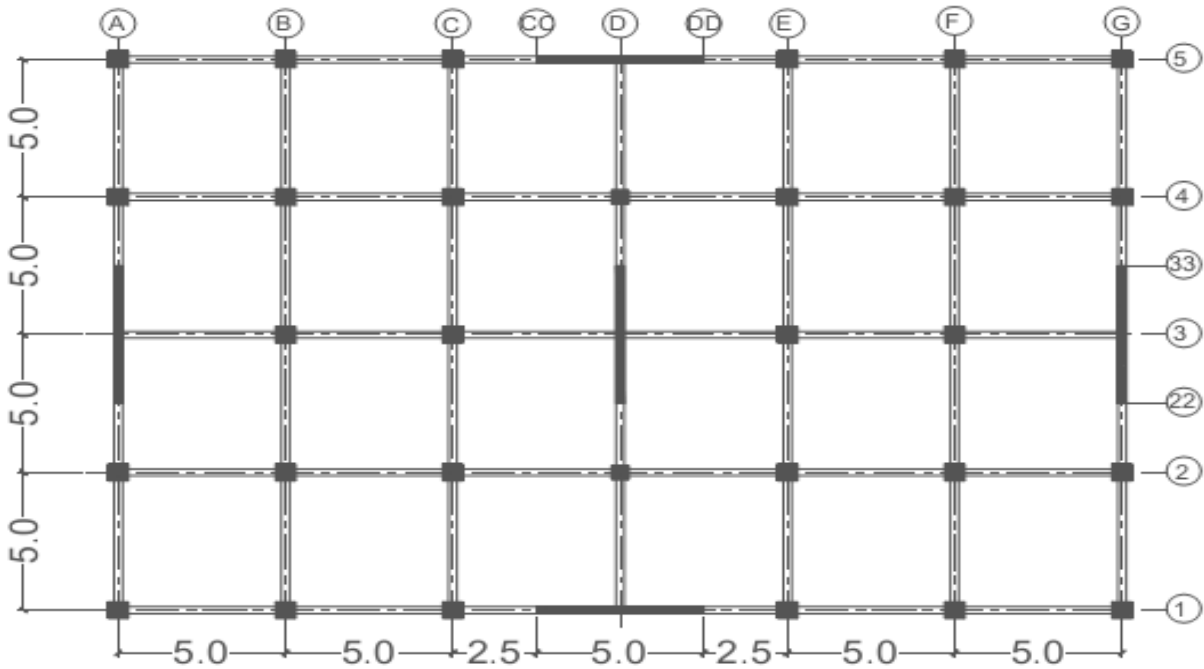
Typical structural layout of building Model 3 (G+15)
